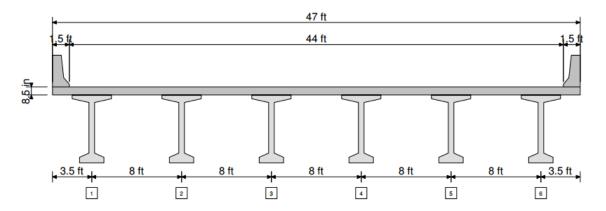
Analysis of Bridge Geometry with 8-ft Girder Spacing
